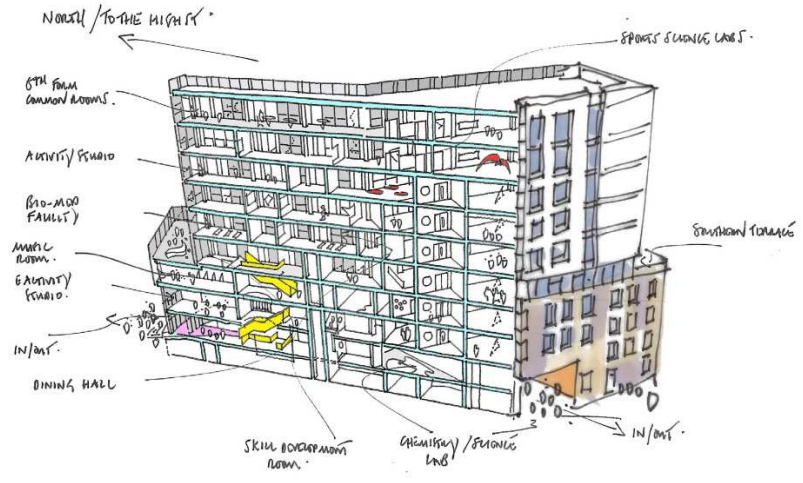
SHaW Futures Academy in Bromley, London. Sketches and rendering (image courtesy of Wates).
